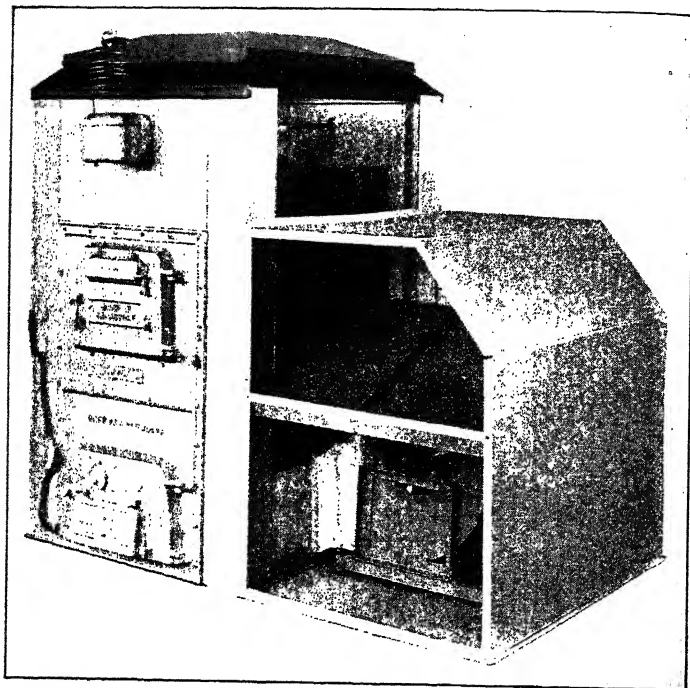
Mechanical Furnace for Winter Air Conditioning
